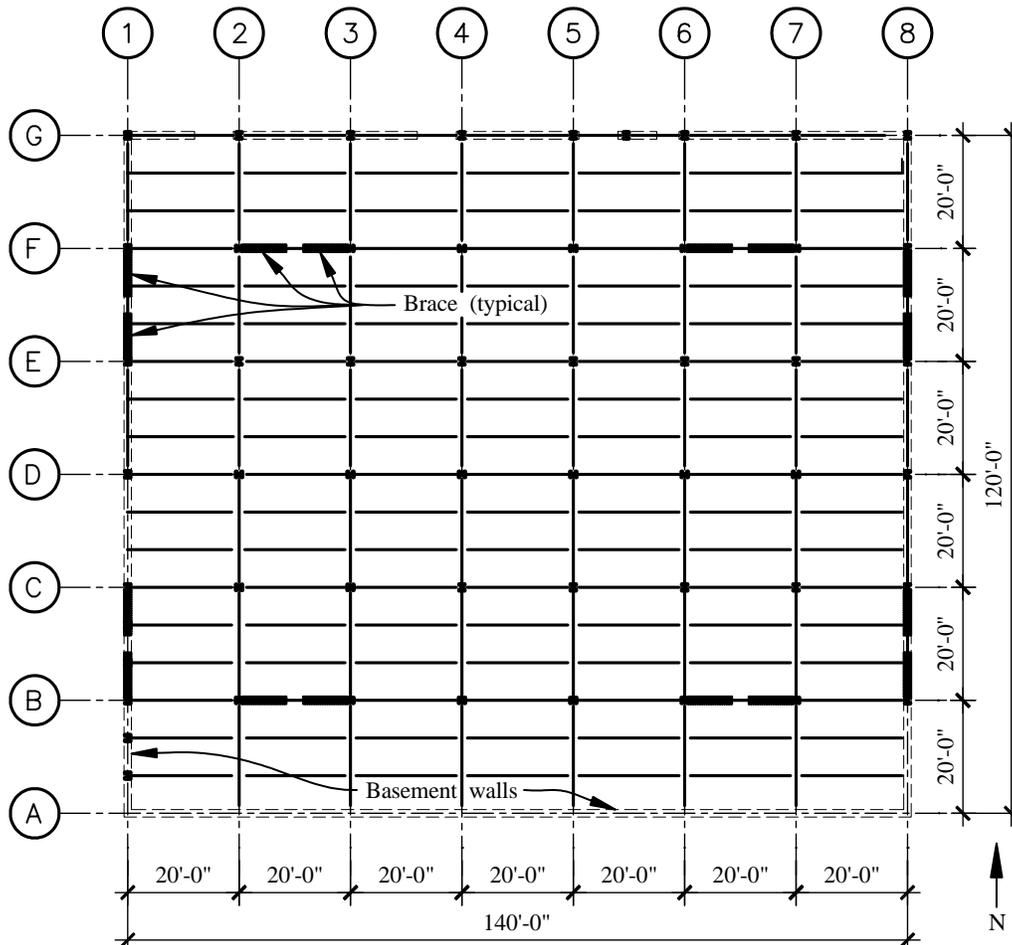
Main floor framing plan (1.0 in. = 25.4 mm, 1.0 ft = 0.3048 m).
